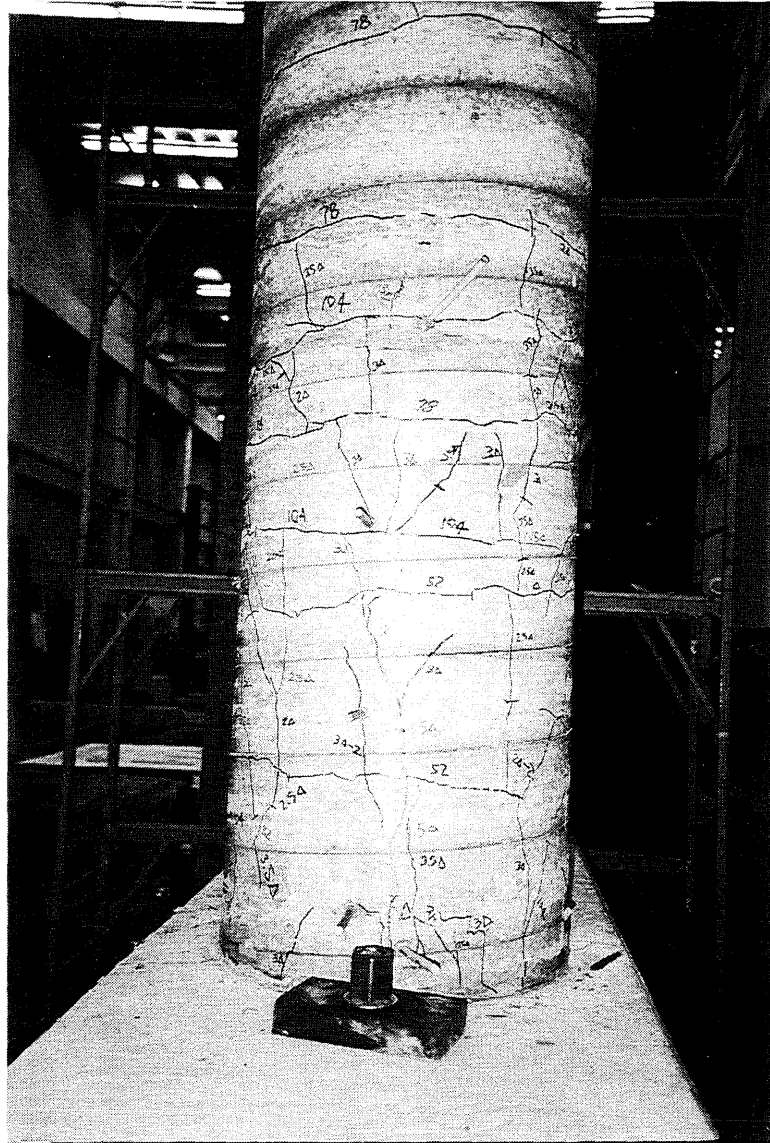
Cracks on Tension Face for Positive Loading
